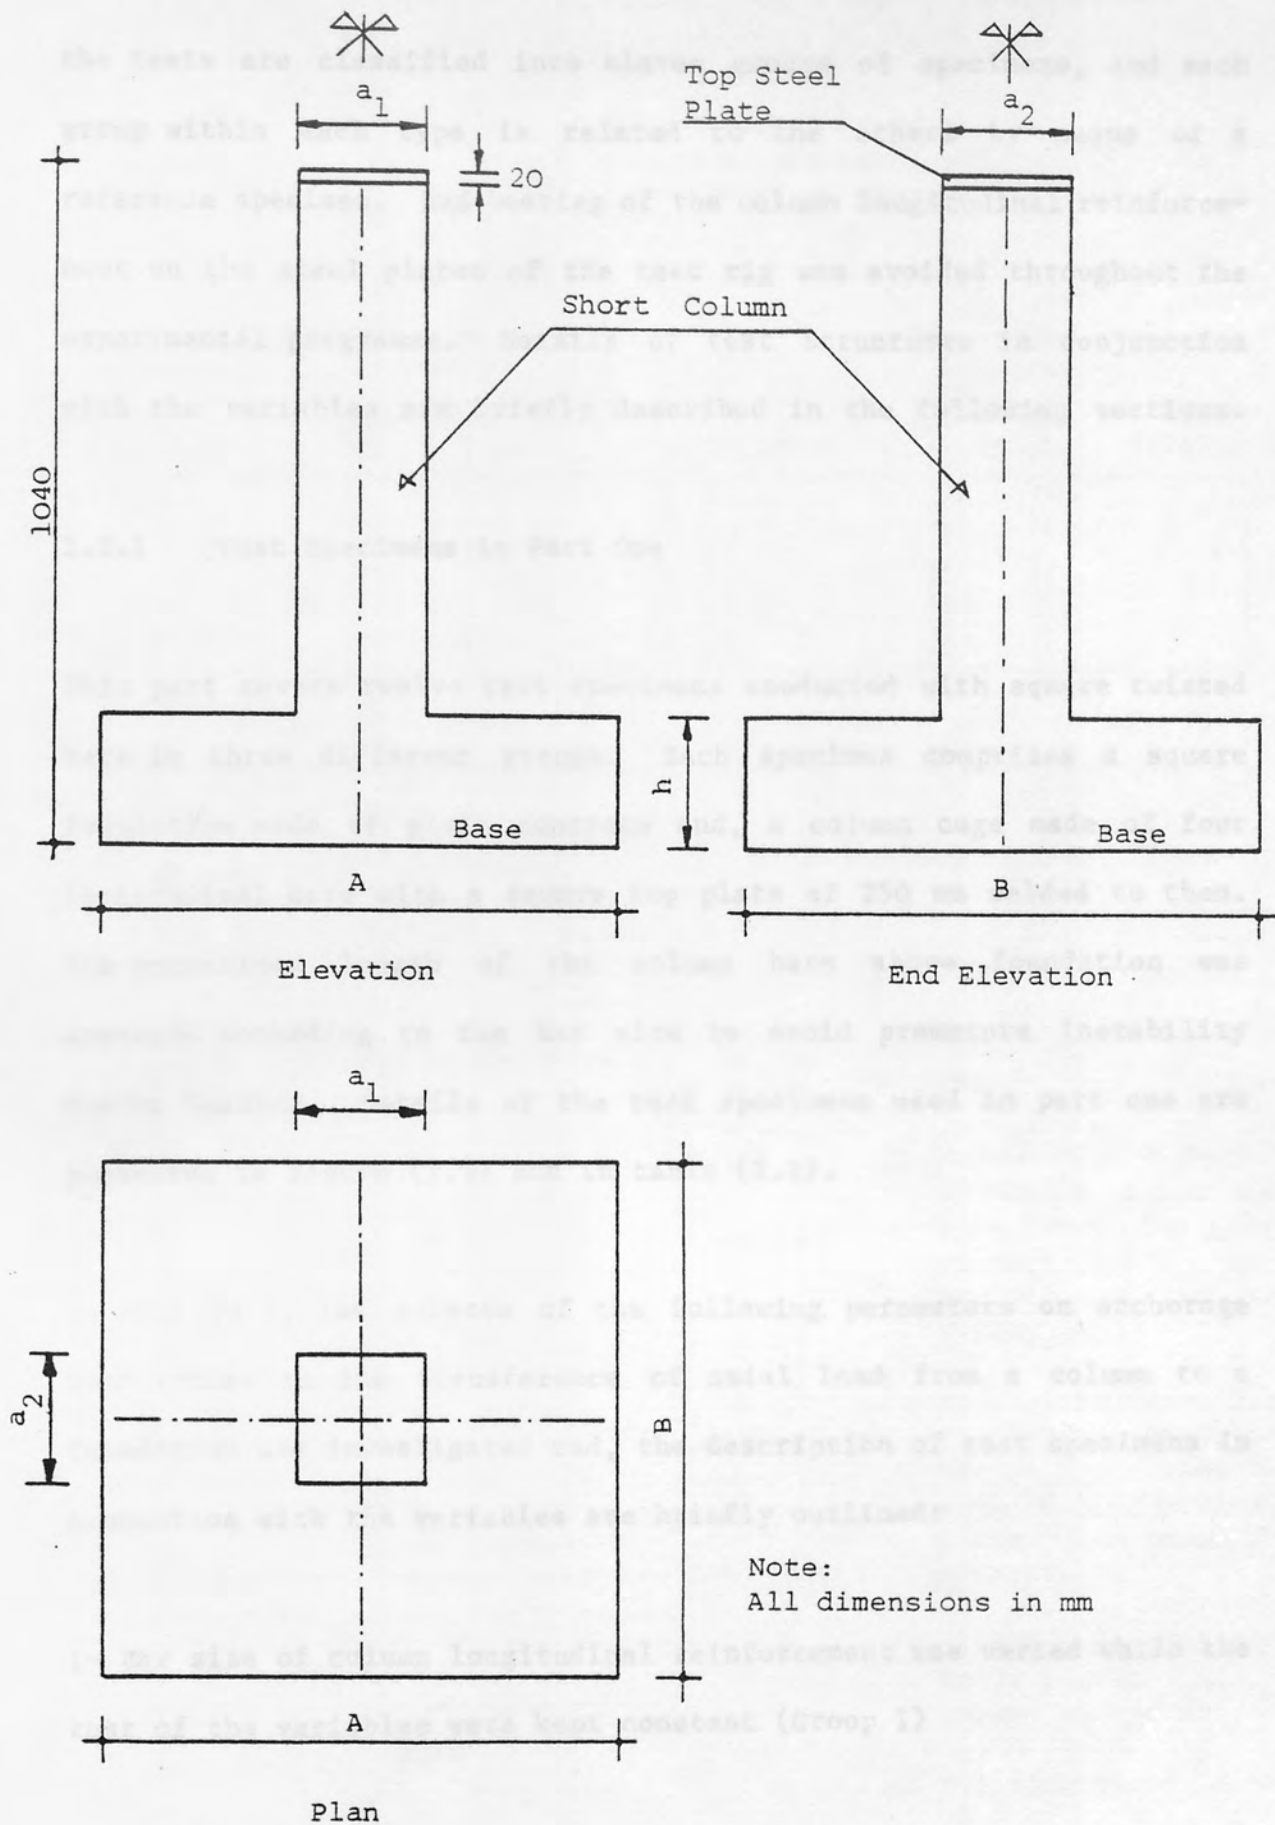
GENERAL VIEWS OF TEST SPECIMENS WITH A SHORT COLUMN
